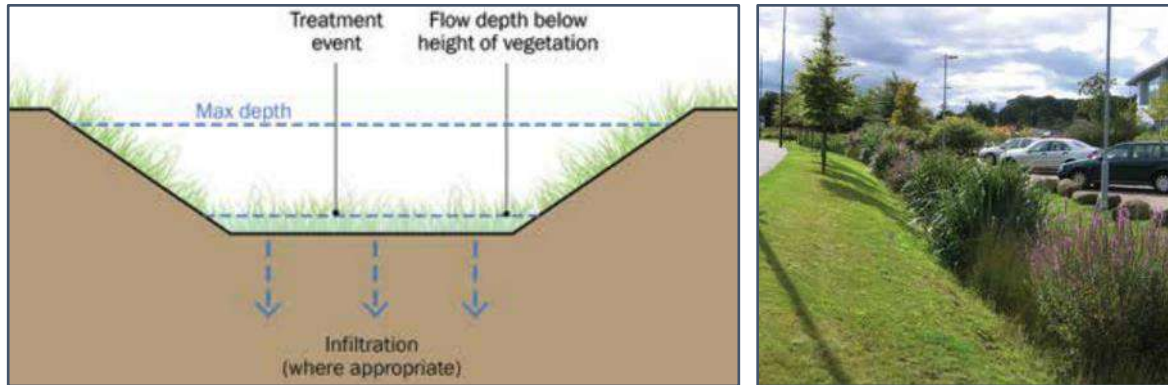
Section and Image of a Typical Swale (SuDS Manual)
